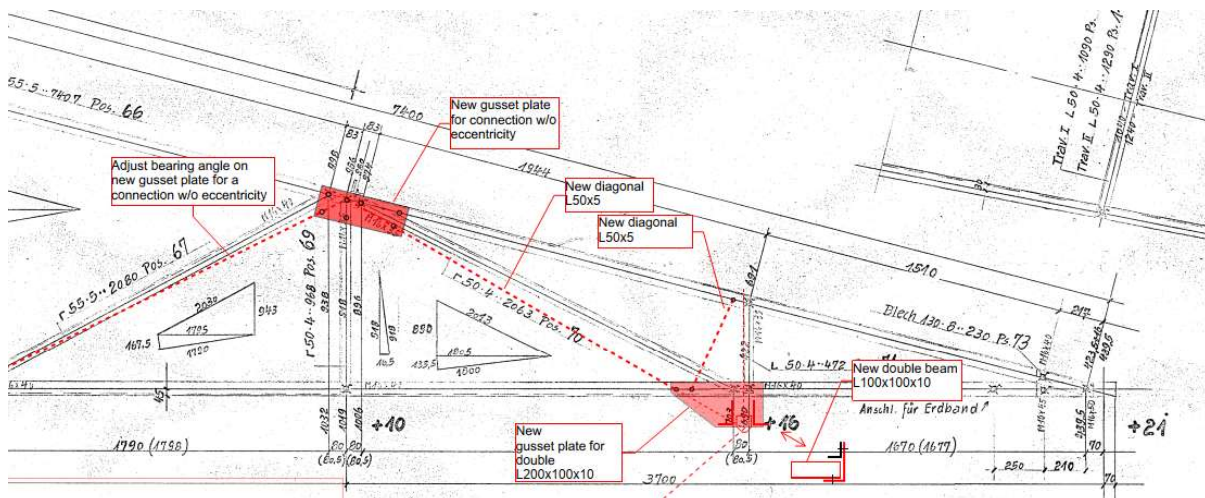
Modification of the top cross arm and outer beam (new beam only sit.1, tower 22, 91 and 92)
